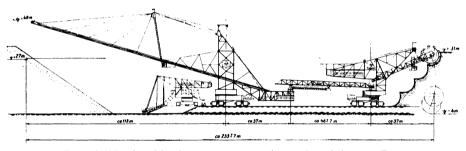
Wheel and bucket excavators work together, Arjuzanx, France.
